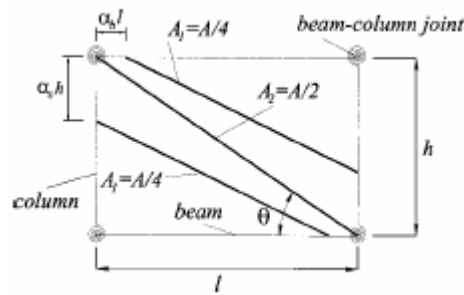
Concrete masonry-infilled steel frame model [10]
